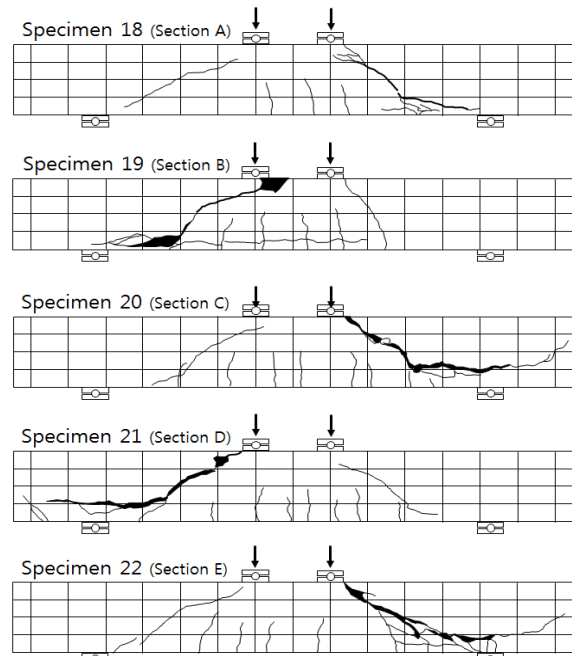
Crack pattern of specimen 18~22 at the end of test
